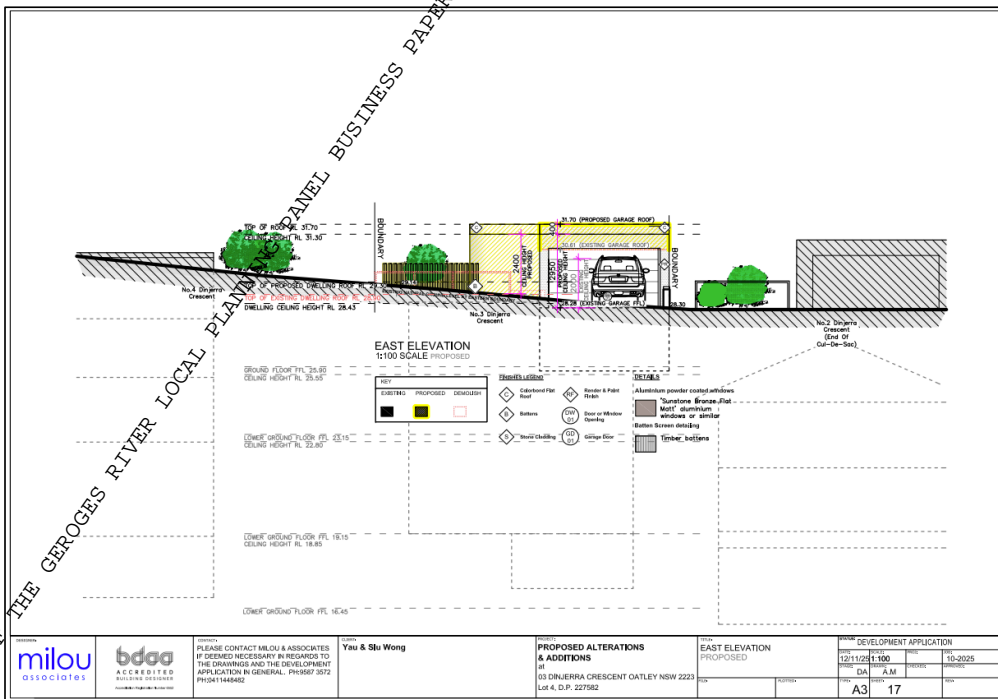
Proposed eastern elevation (Milou & Associates, 2025)
